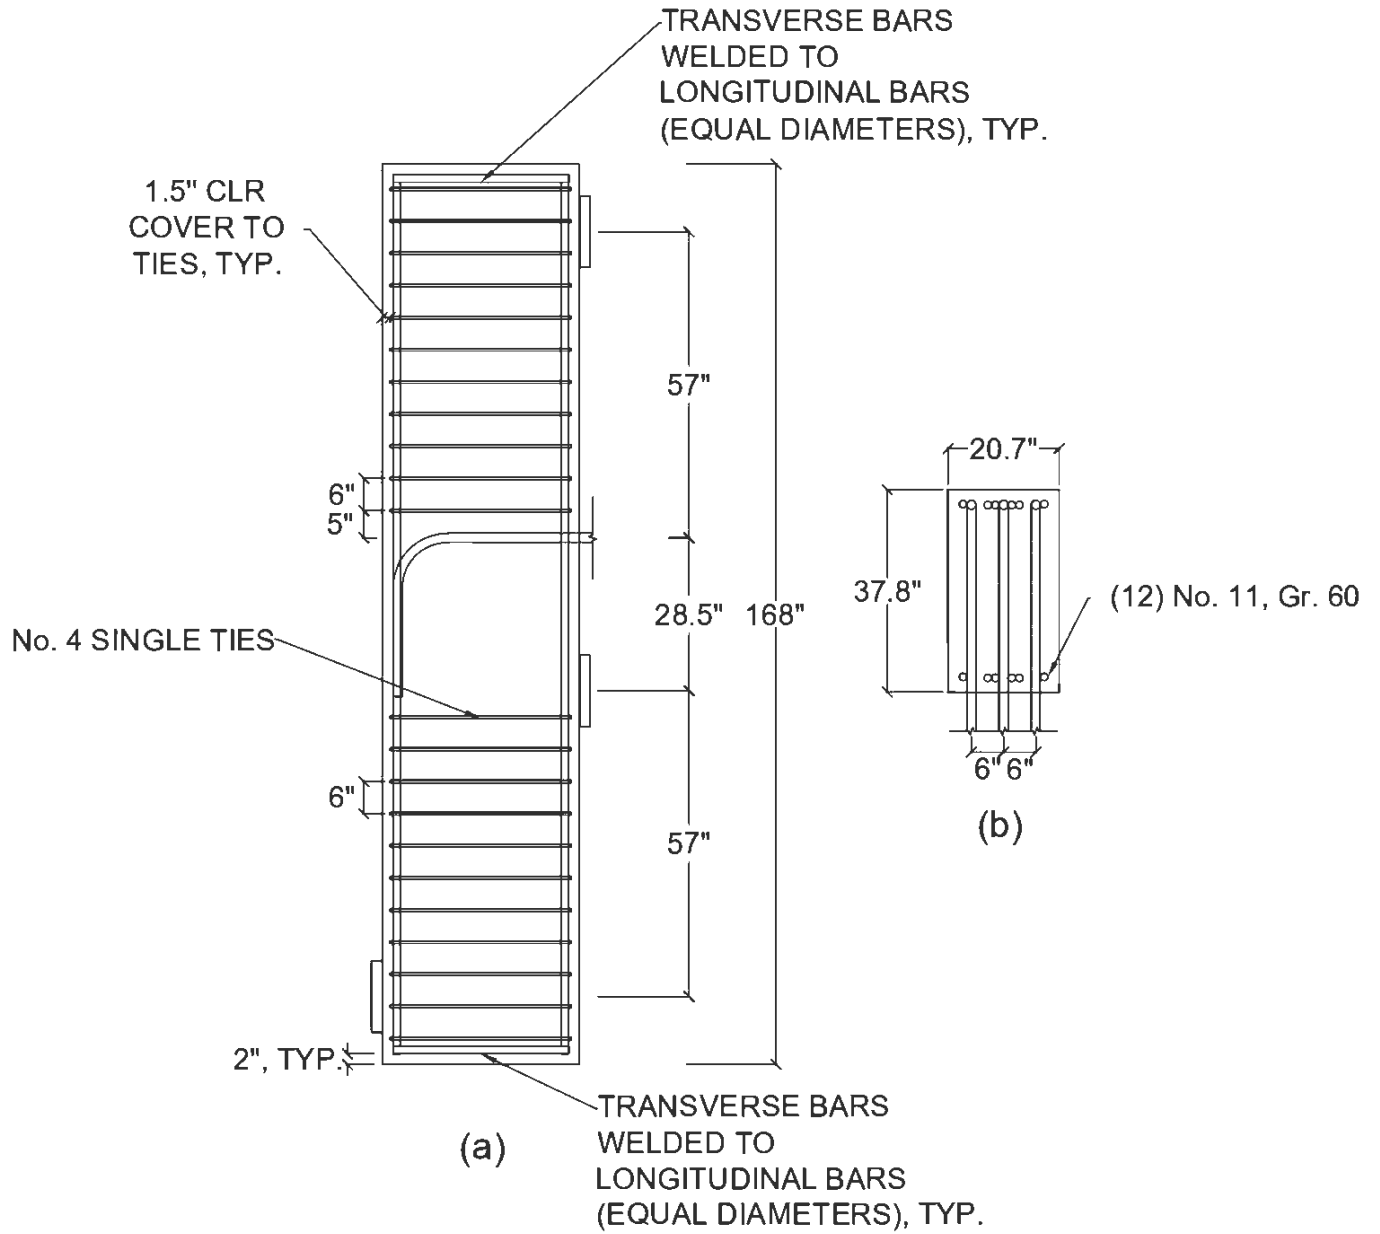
Details of reinforcement layout for No. 14 hooked bar specimen H14-7: (a) elevation, (b) cross-section
